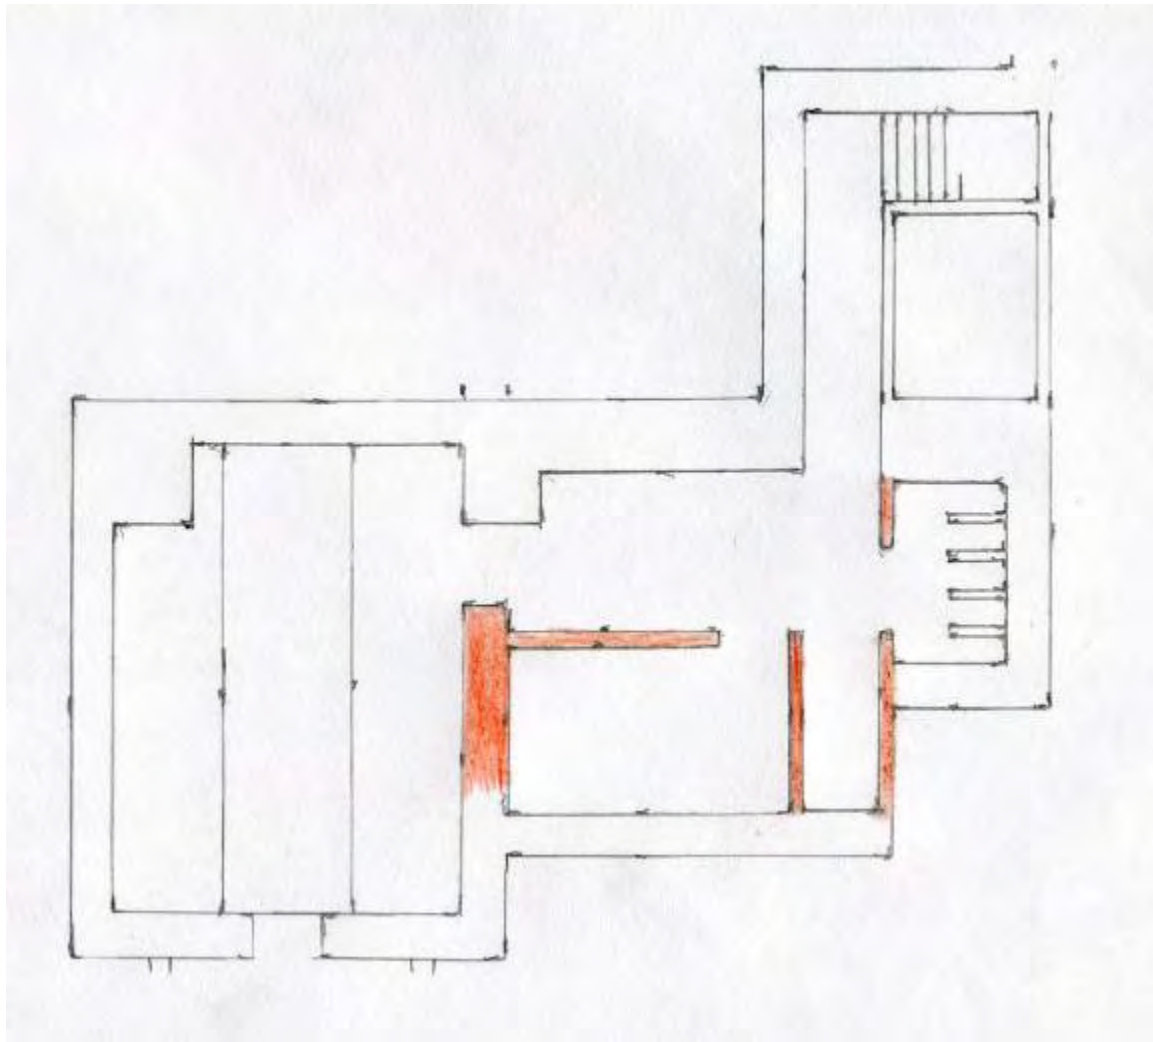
Tracing of early 2000s basement plan showing walls since removed by previous works to open up the eastern cellar [Not to scale]
